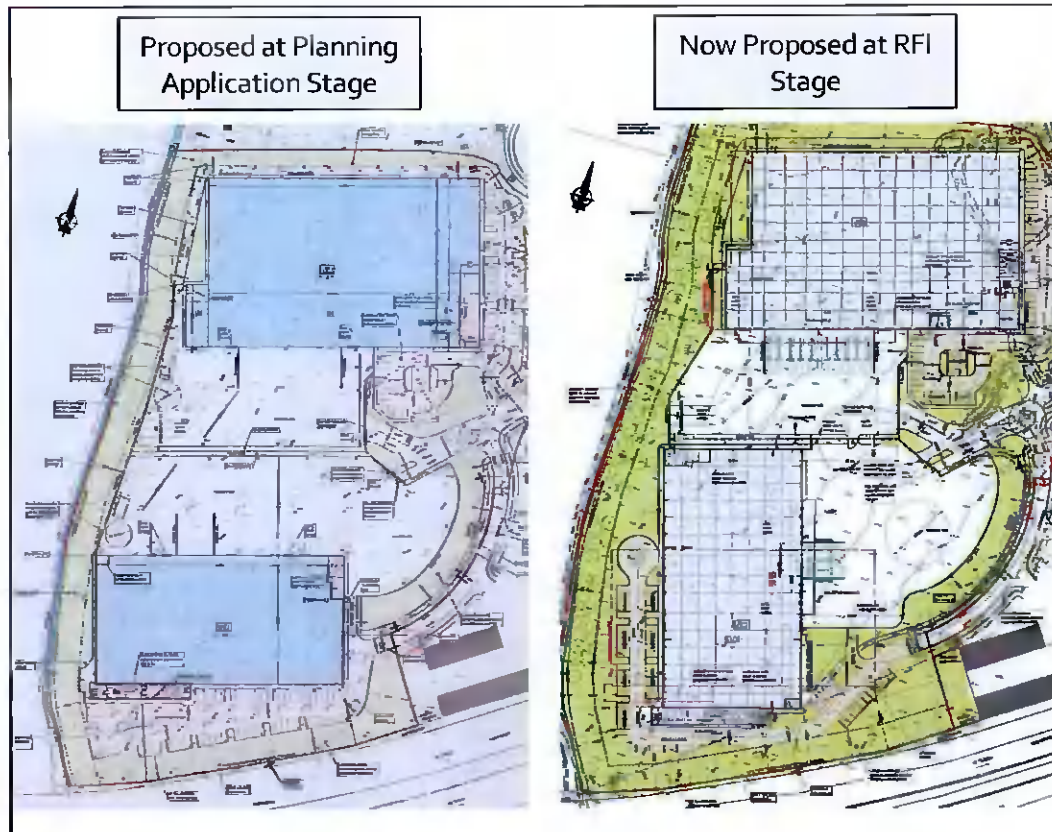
Site Plan Proposed at Planning Application Stage (Left) and Site Plan Now Proposed at RFI Stage (Right)
